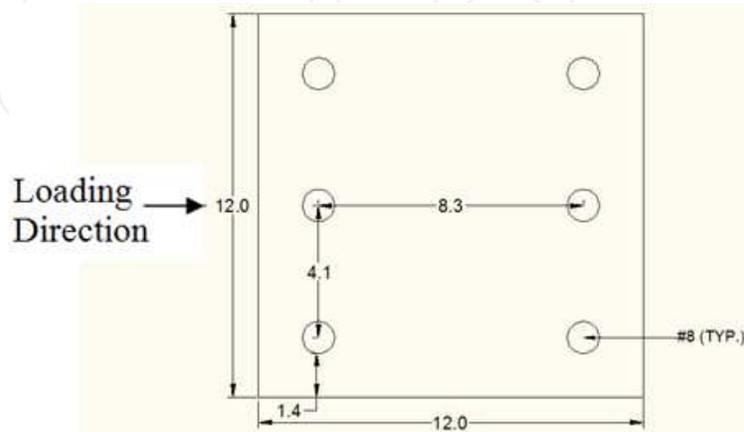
Cross-Section of SCSFC Column (dimensions in inches)
